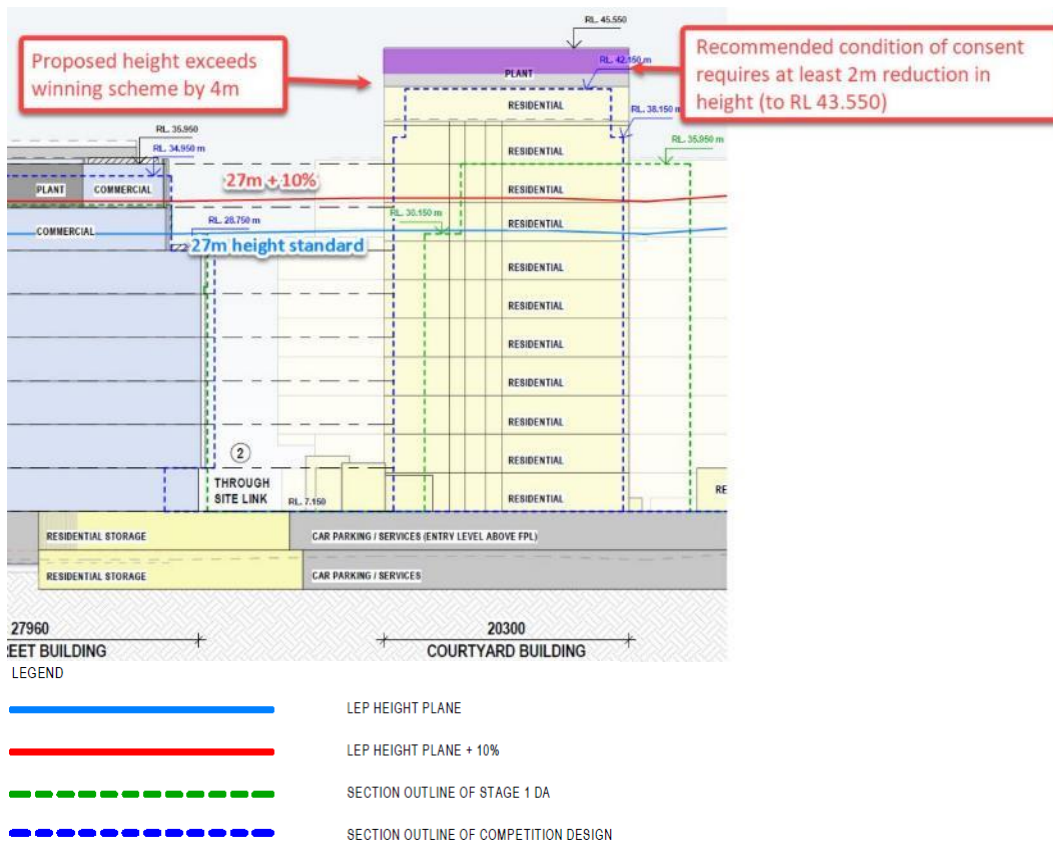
Building C - Courtyard Section: Proposed/modified building envelope
